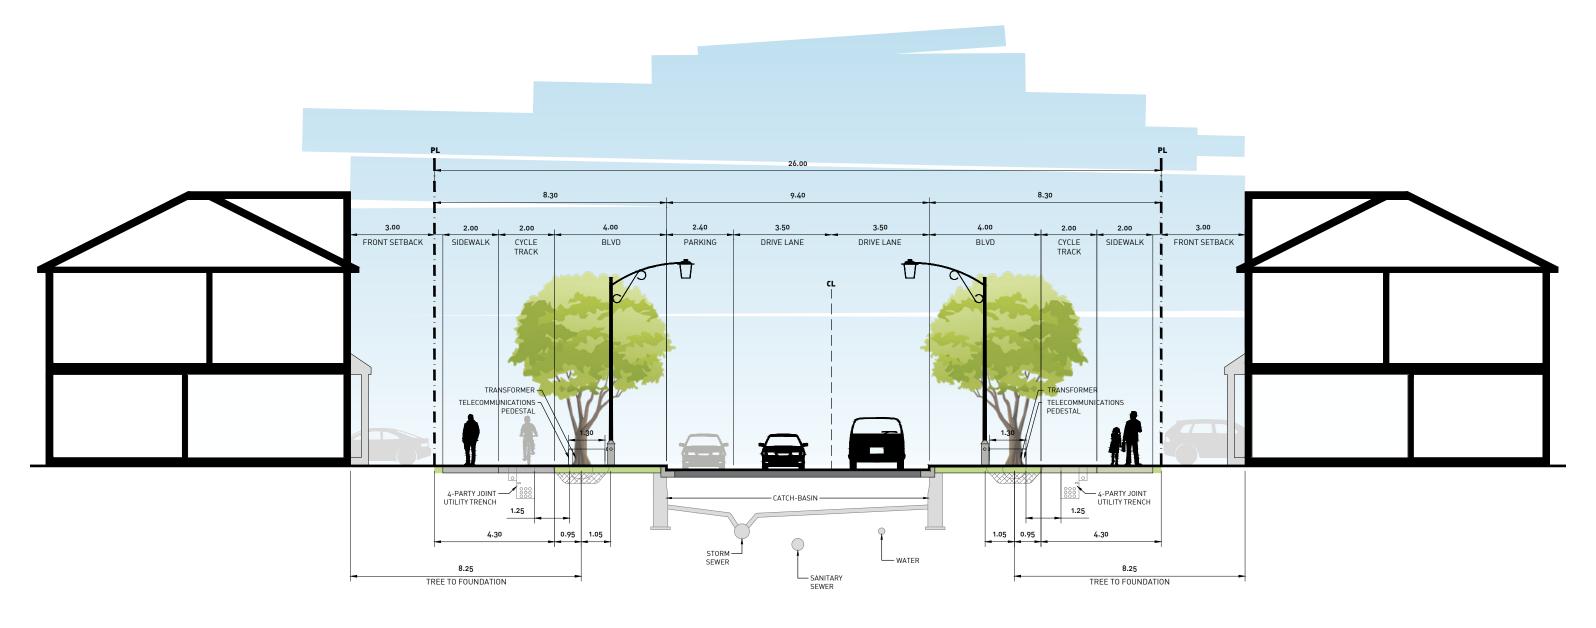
26.0m Collector Road (with On-Street Parking) Right-Of-Way Section
